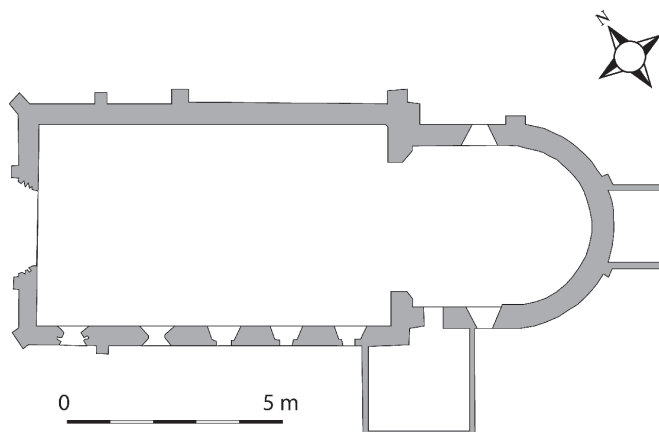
Plan of the church Notre-Dame, Rugles (after Coutil, 1921)
